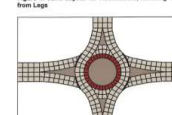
Joint Layout for Roundabout, "Pave-Through" Option
